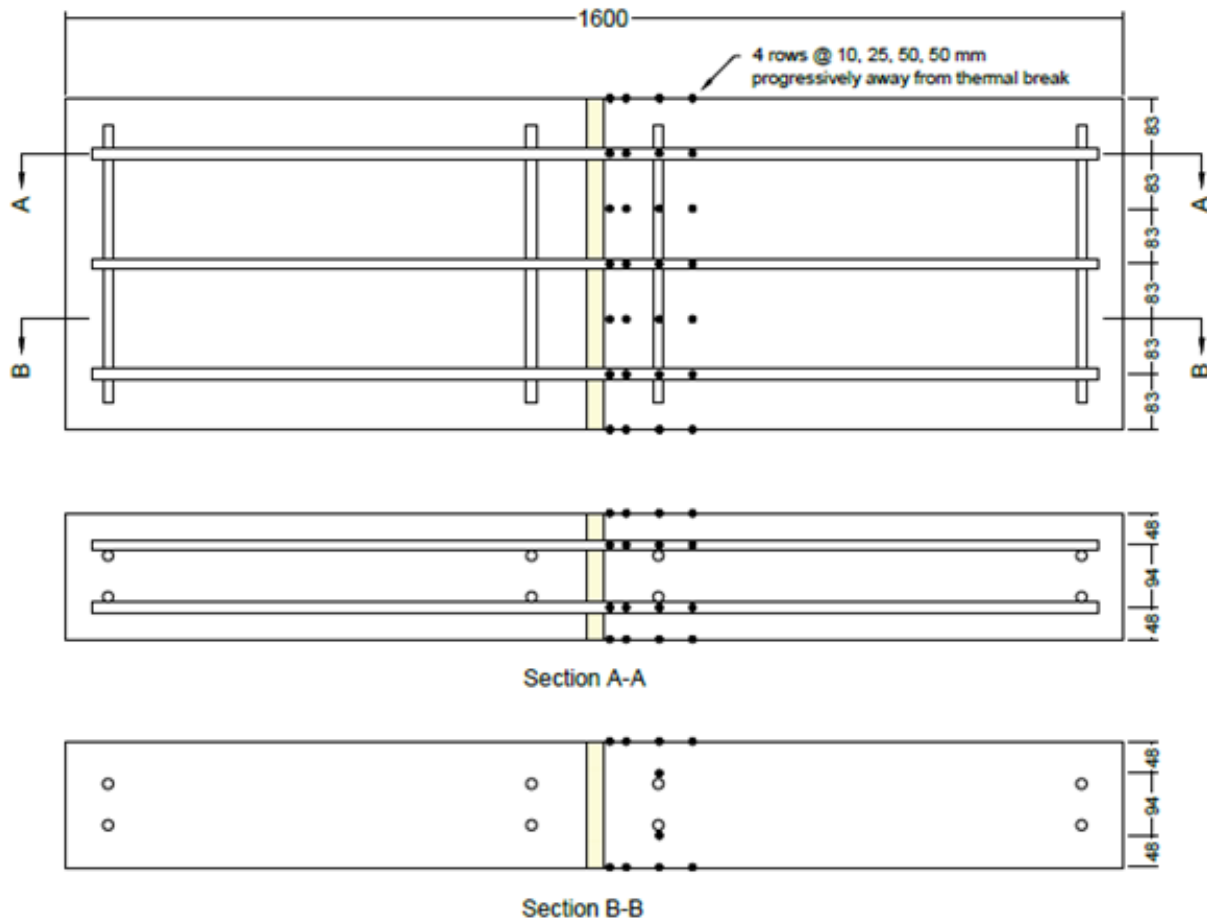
Thermistor layout for mock-up sample, dimensions in mm
